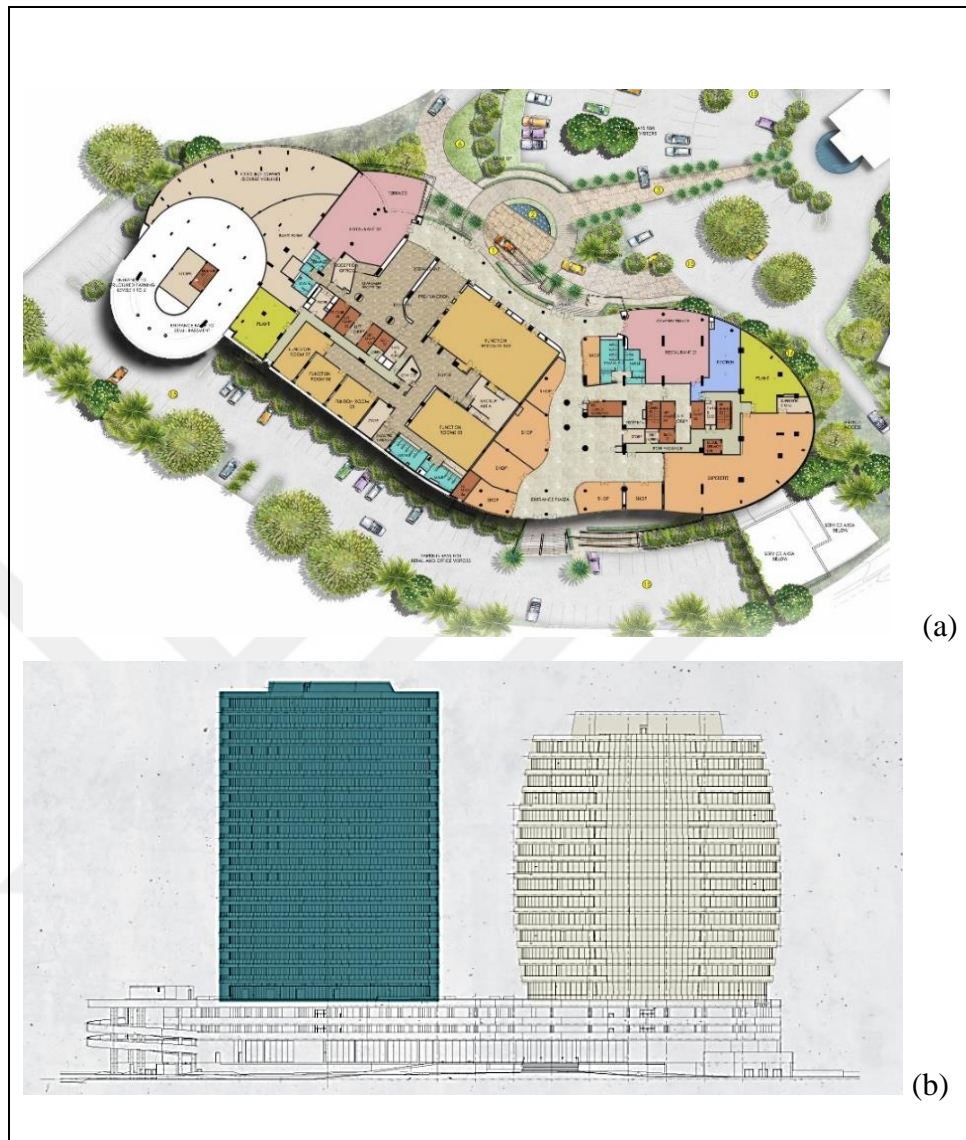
Torres Rani Towers (a) Ground plan (b) Longitudinale section [129]
